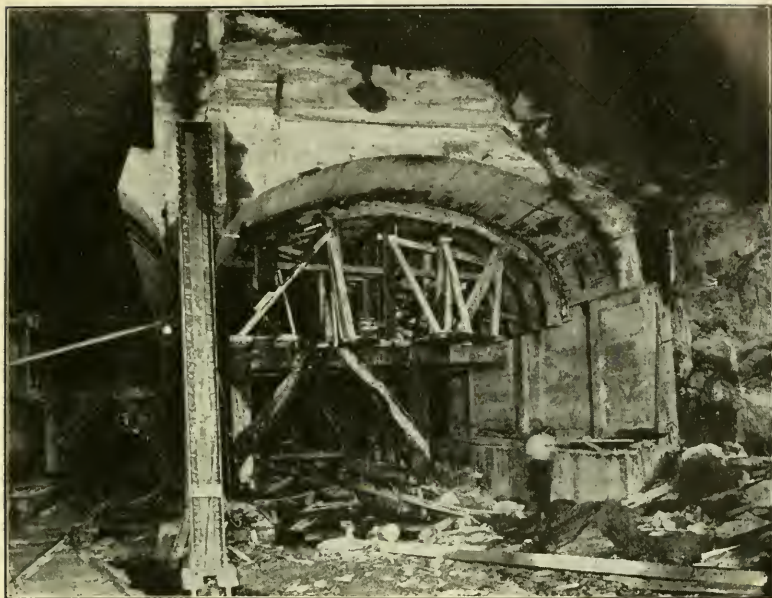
HALF OF ROOF IN 96TH STREET STATION CONCRETED.
